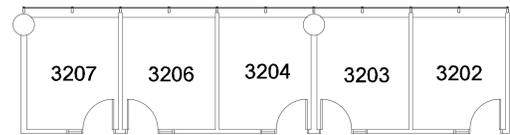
Third Floor Canal Building West Façade Single Occupant Offices
